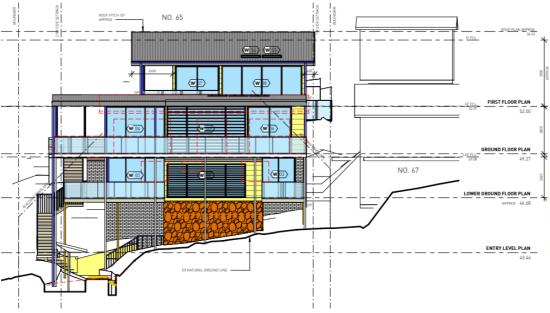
Proposed Section BB Source: Giles Tribe Architects
